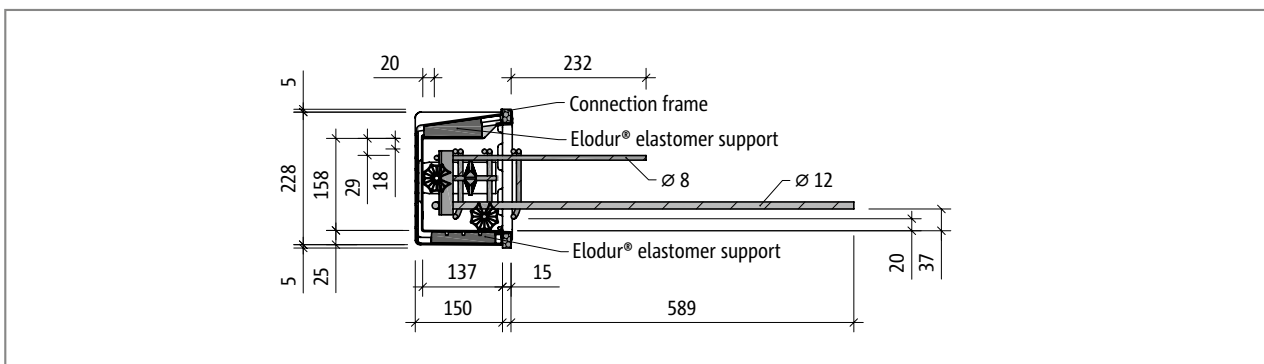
Schöck Tronsole® type Z-V+V-T respectively type Z-VH+VH-T: Vertical cross-section
